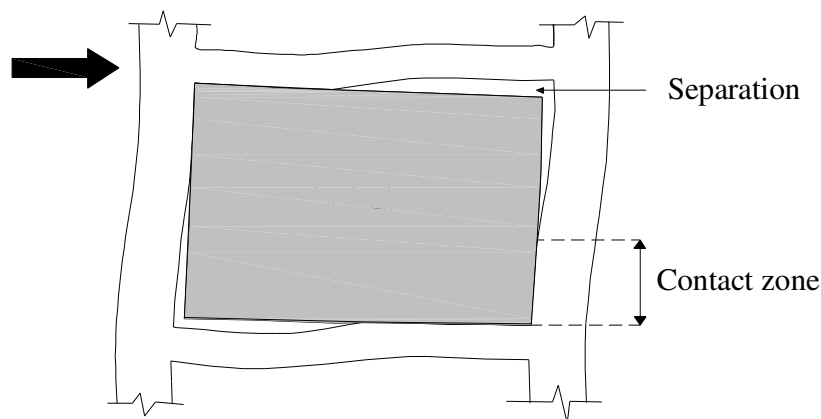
Typical deformation of infilled frame under lateral loading.
